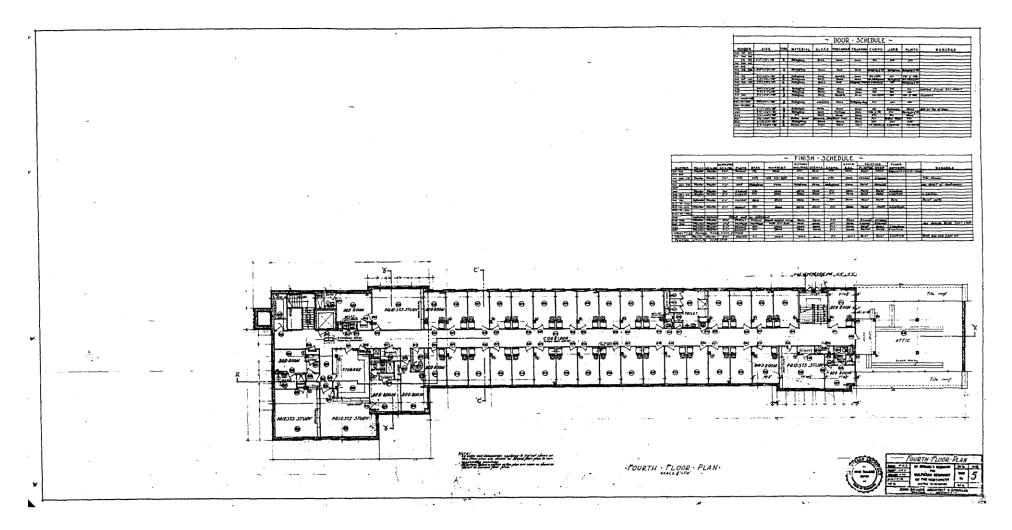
John Graham Sr. Architect & Engineer. Saint Edward Seminary Building. Fourth Floor Plan. 1931.
